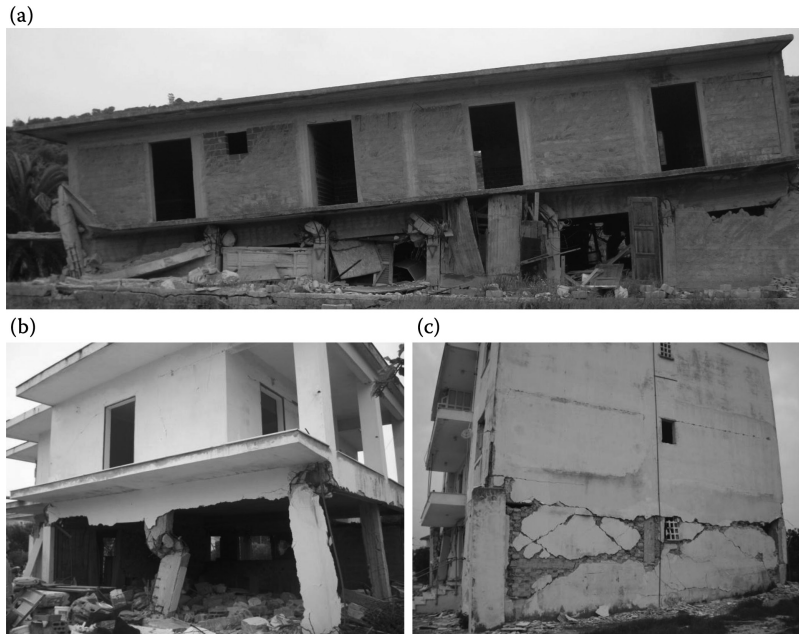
Typical concentration of failures or damage in ground storey (a), (b) with role and damage to infills shown in (c).
